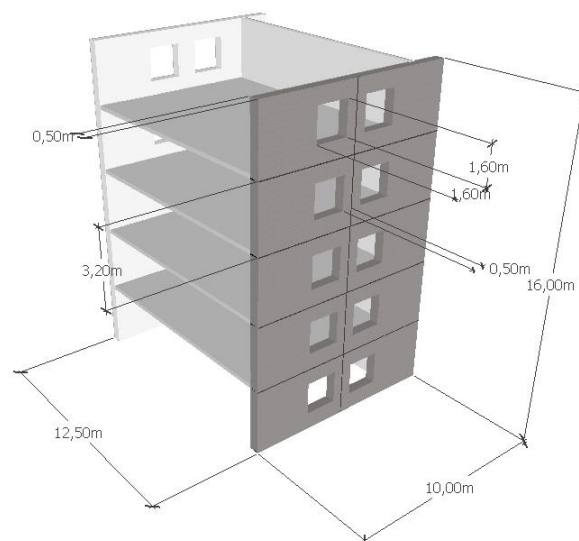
Example of a stability structure consisting of precast concrete shear walls
